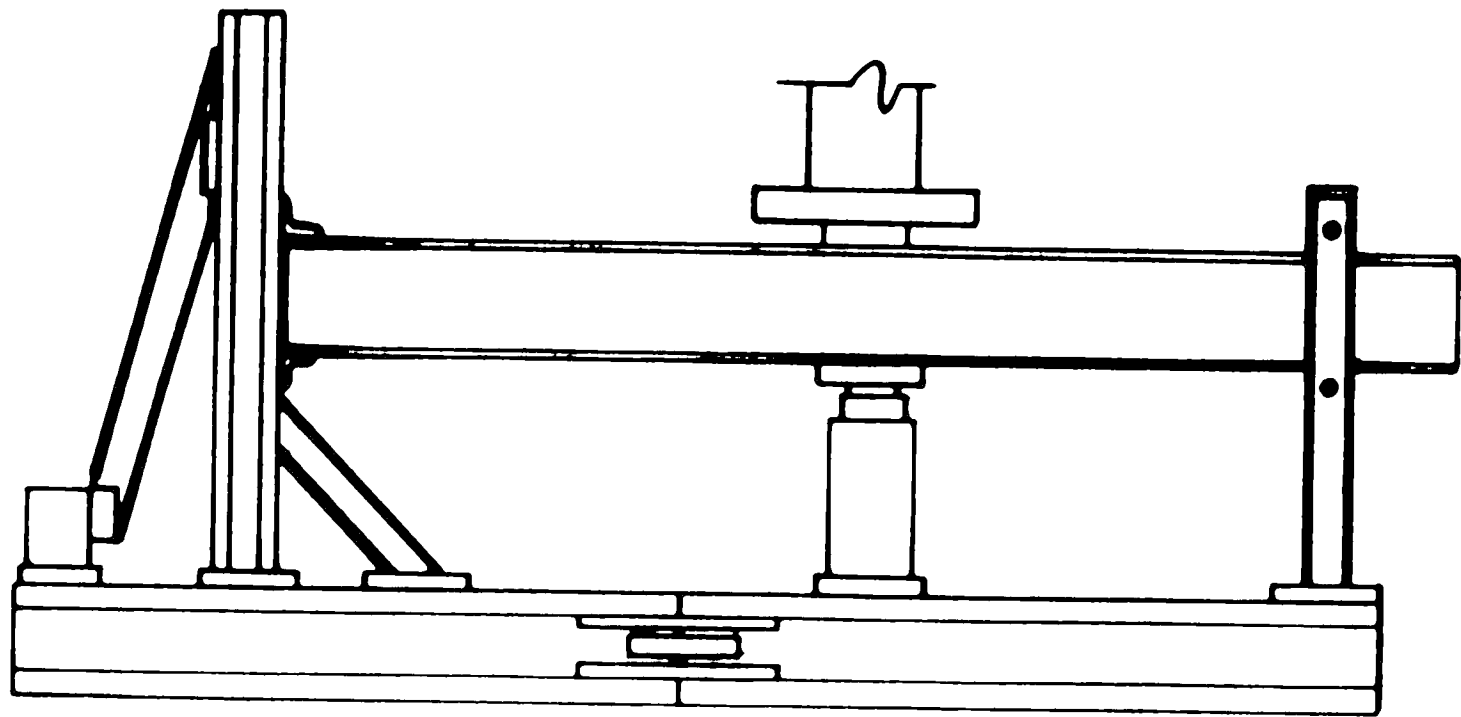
Propped Cantilever Test Frame for Beam-to-Column Connection.
